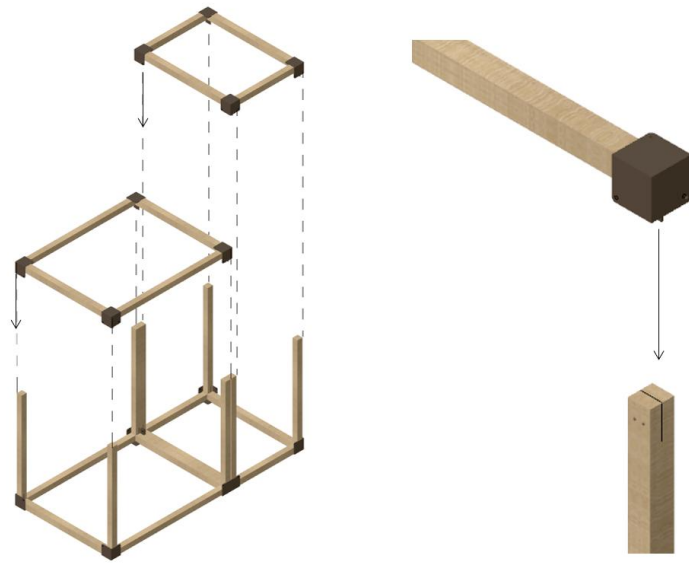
Frame and Floor Assembly: Modular Timber Post-and-Beam Erection Sequence by the author)
